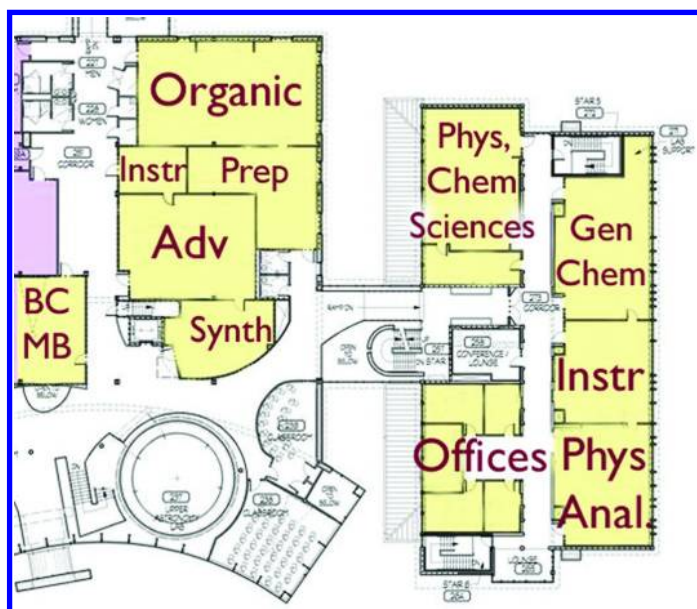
Schematic structure of East building and the eastern portion of the South building, second floor.
